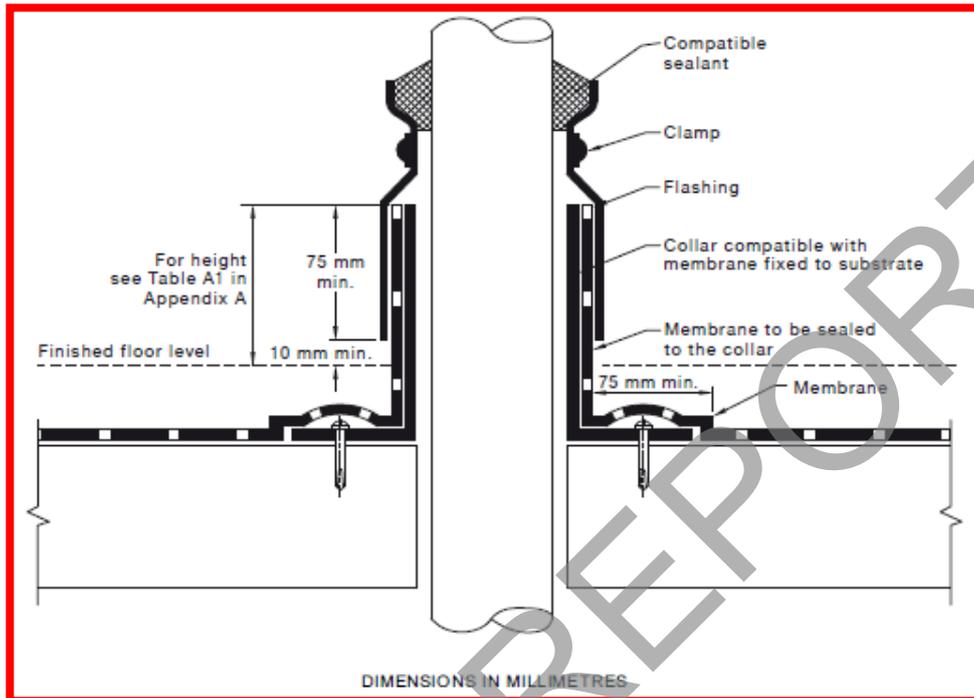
Figure 2.10 - Typical Details Of Vertical Penetration Using A Collar.
